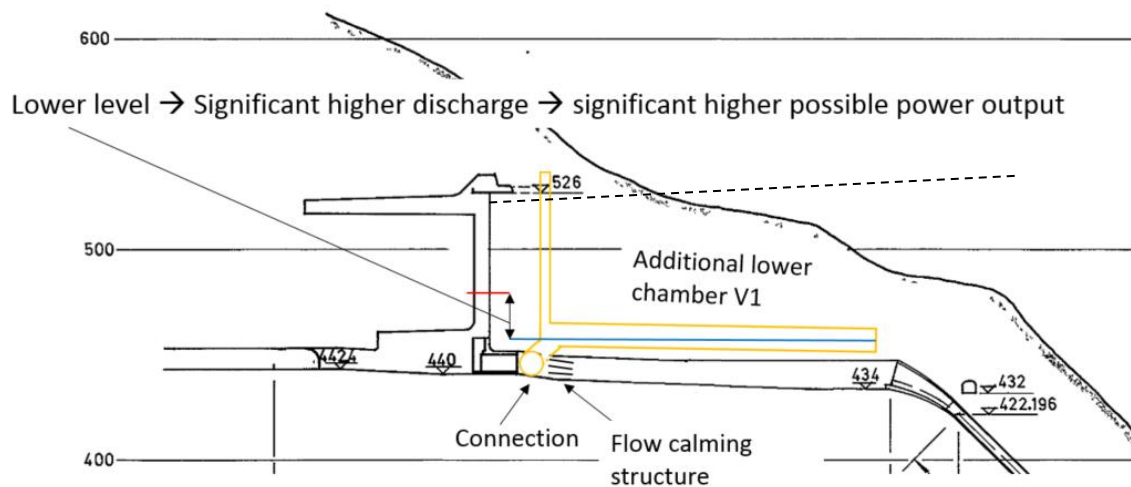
Schematic section of surge tank expansion with added lower chamber, critical overburden
